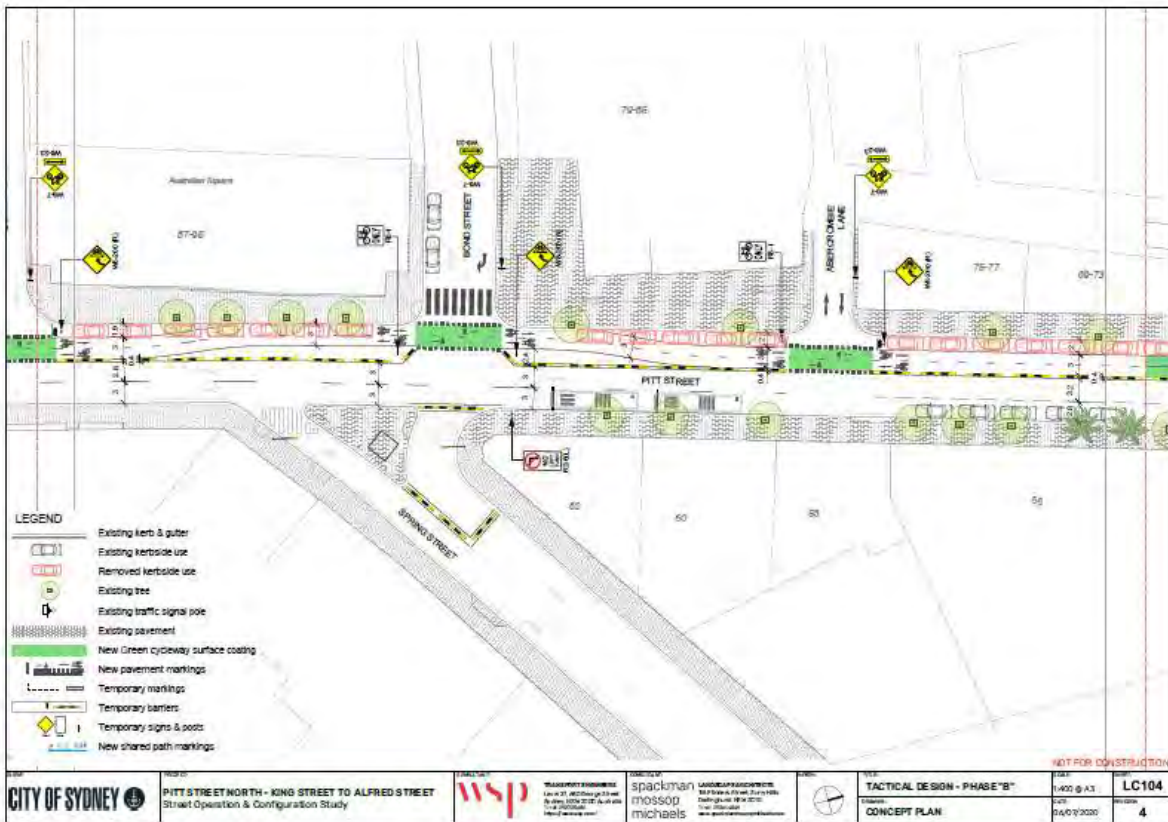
Tactical Design Plan – Phase B – Concept Plan [Drawing LC104 Rev4] (Source: City of Sydney, WSP, spackman mossop michaels, 2020)
